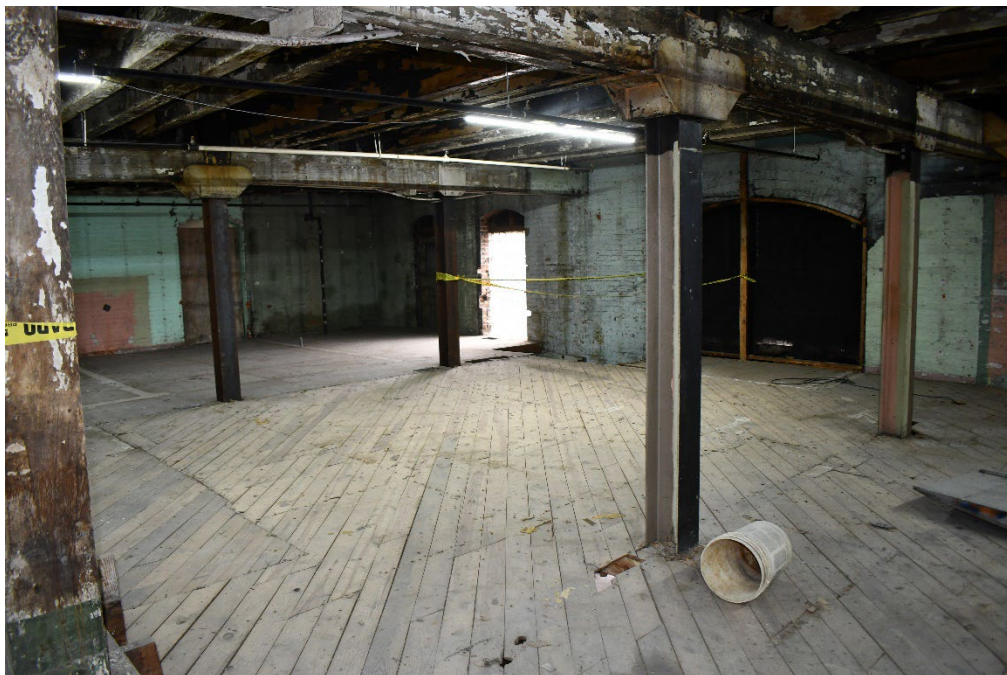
First floor, elevated loft area, note wooden posts replaced with steel wide flange beams. (0014)
